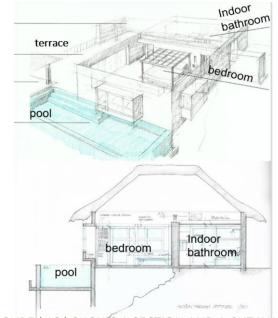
SHOWS A SECTION AND A CUTAWAY
